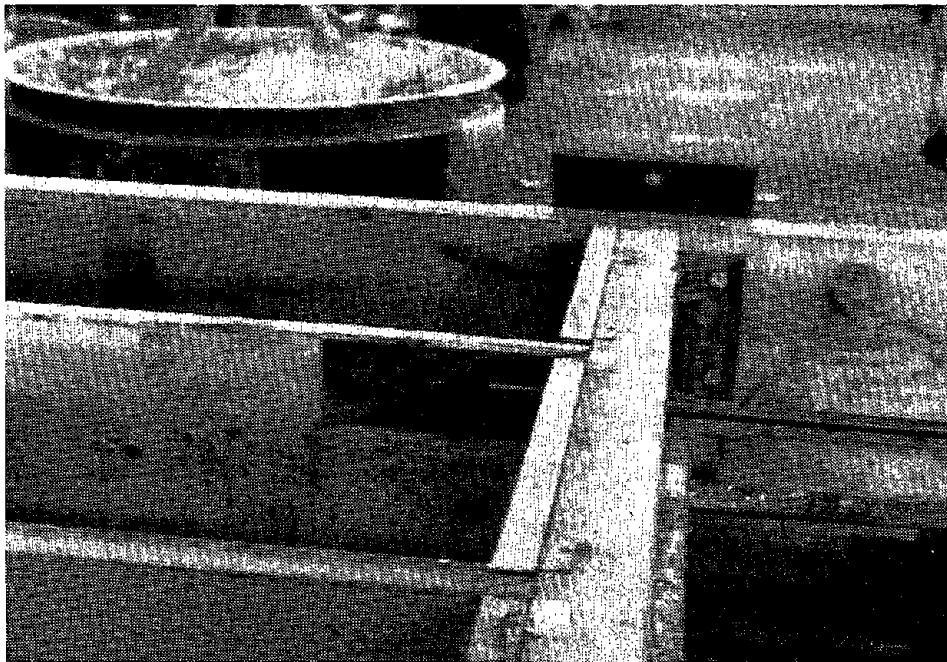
FRAMING DETAILS OF WOOD SHEATHED DIAPHRAGMS.
